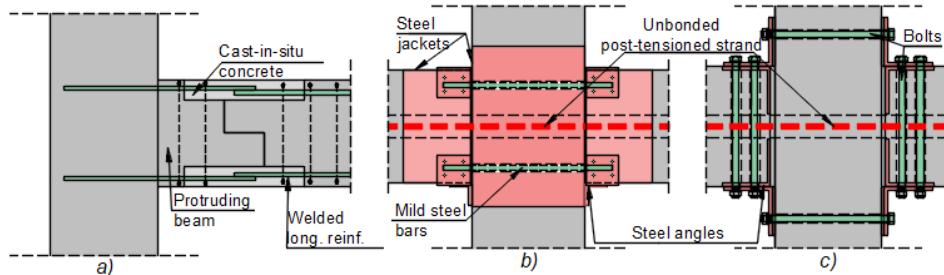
Beam-to-column connections: a) with partial cast-in-situ concreting – adapted from Xiao et al. [18], [19] and Ding et al. [20], b) post-tensioned connections – adapted from Wang et al. [21], c) Cai et al. [22]
